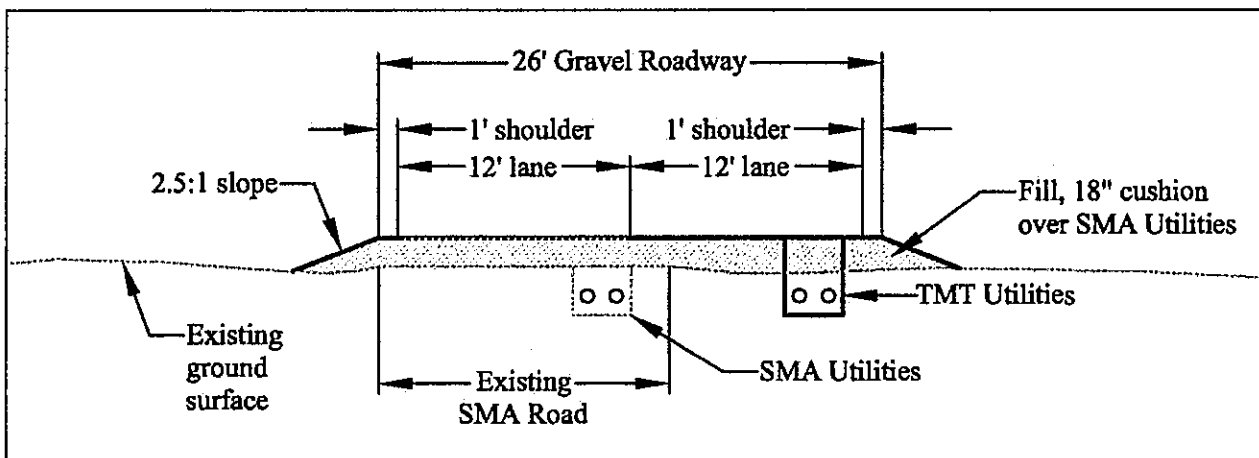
General Cross Section of Access Way in Lava Flow Section Overlapping SMA Road
